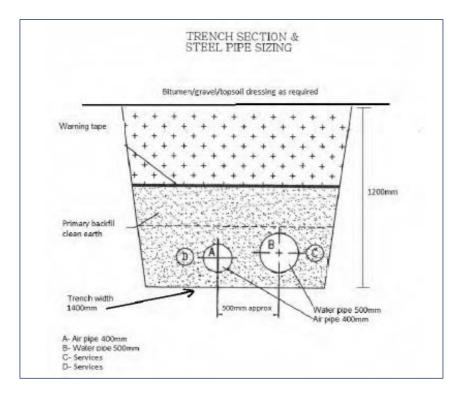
| Typical trench section with steel pipe sizing (Source: Applicant's documentation)
